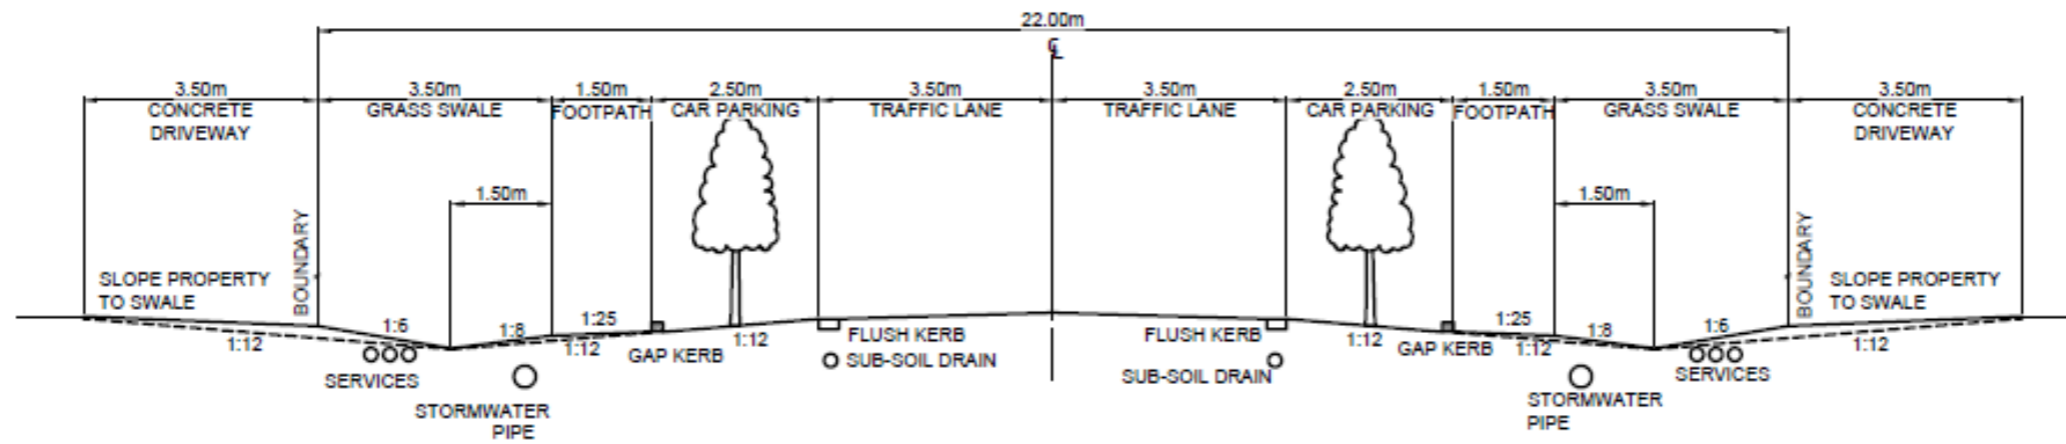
Te Kauwhata Structure Plan – Road cross sections – Local Roads
